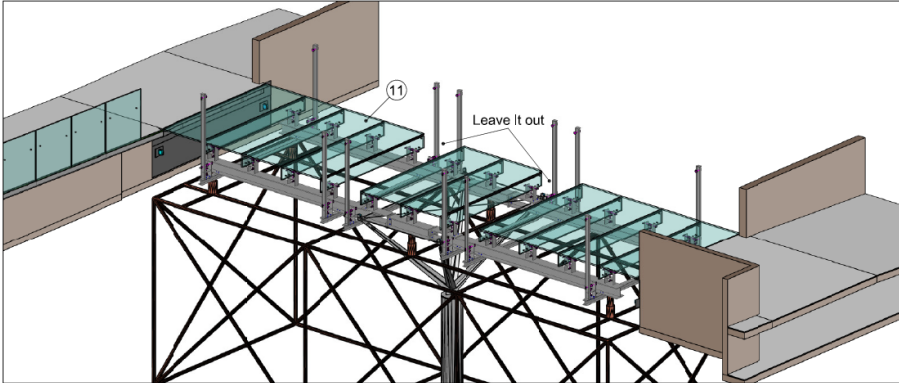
Installation Sequence 11) Installation and adjustment of 8/10 glass floor elements
